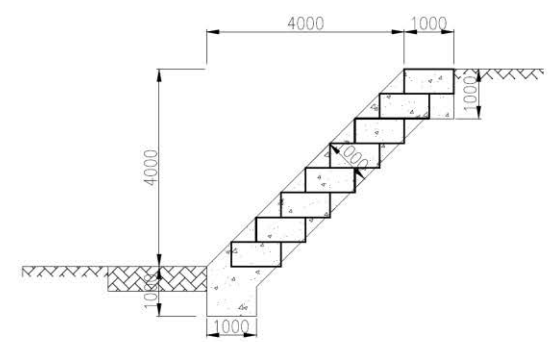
Typical Cross-Section of Riverbank Protection Works along the Mainstream
